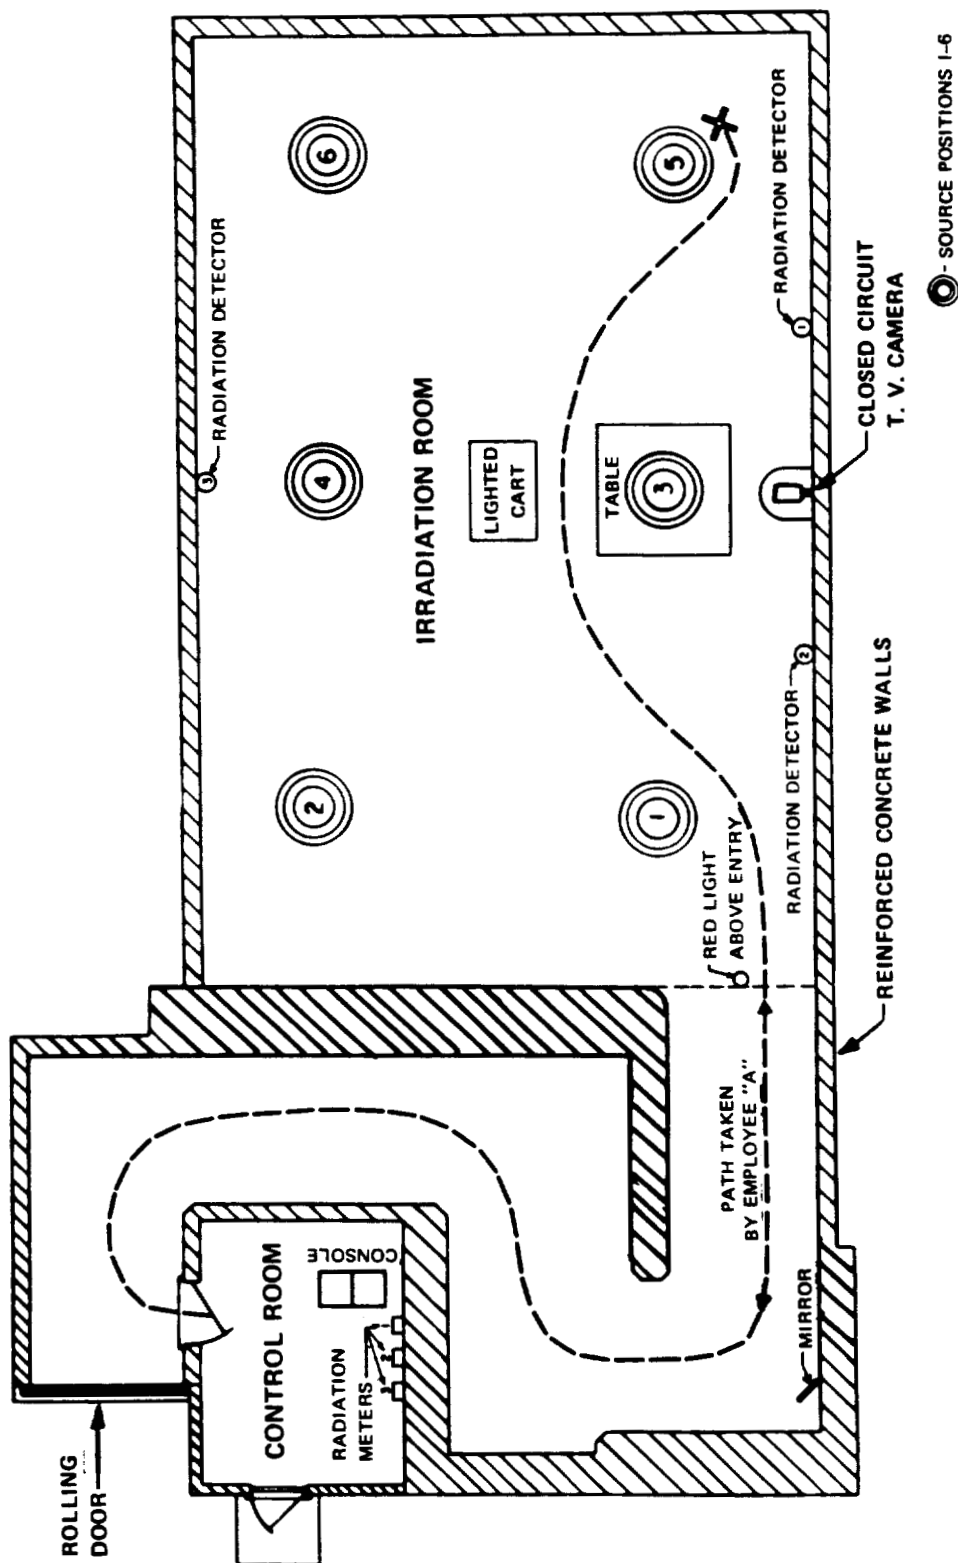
VARIABLE DOSE RATE FACILITY — FLOOR PLAN
